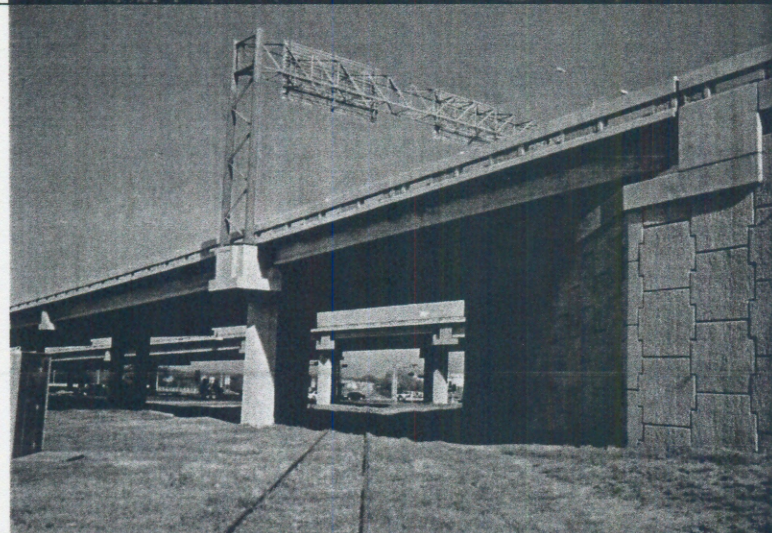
View looking northwest at the eastern end of the eastbound bridge.
